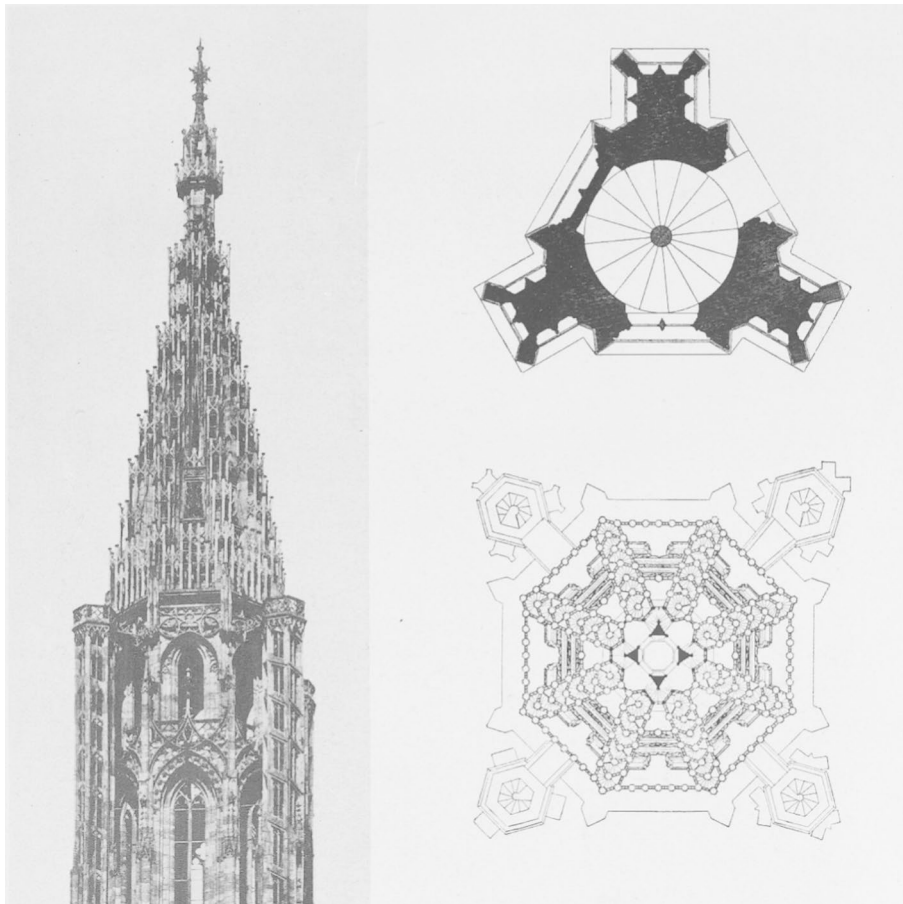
The tower of the Strasbourg Cathedral, floor plans of the tower octagon and of a stairway tower. Delhio, Georg. 1922. *Das Straßburger Münster*. München: Piper: 75. <https://doi.org/10.11588/di-glit.12157#0078>. Accessed 24 February 2023
